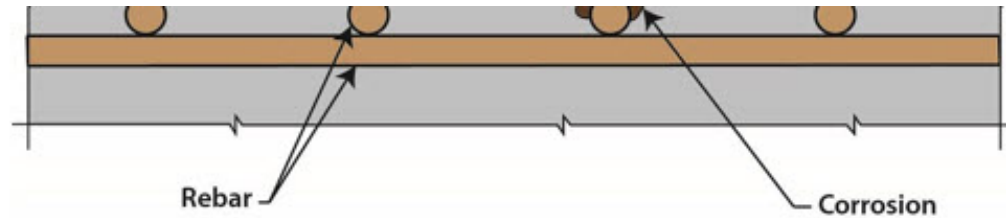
Typical Reinforced Concrete Deck and Slab Deterioration
